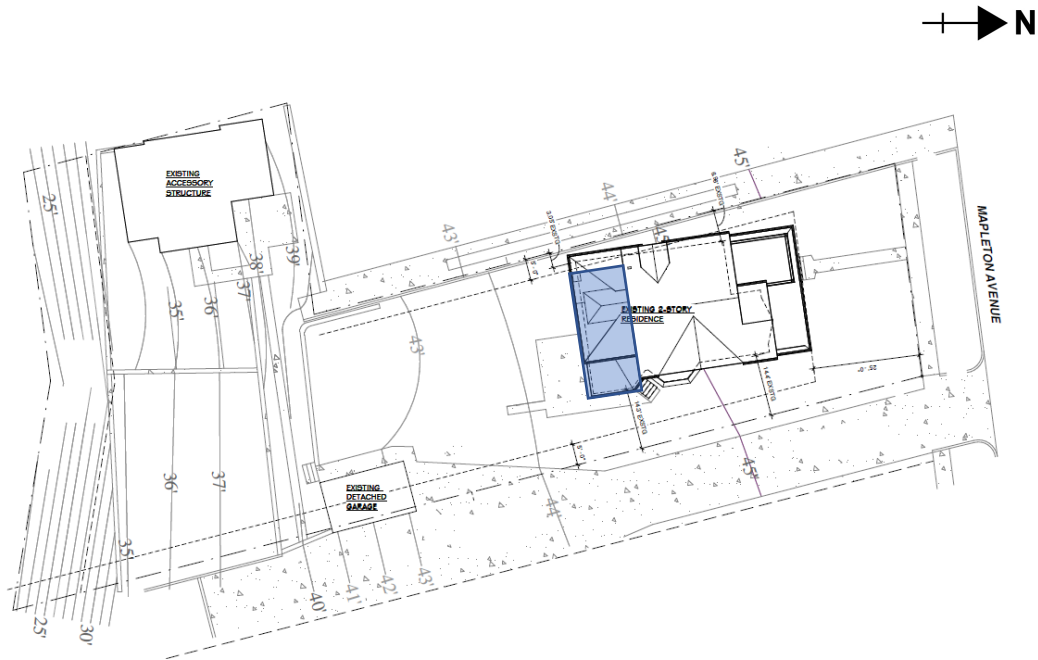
936 Mapleton Ave., existing site plan (area proposed for demolition in blue).
